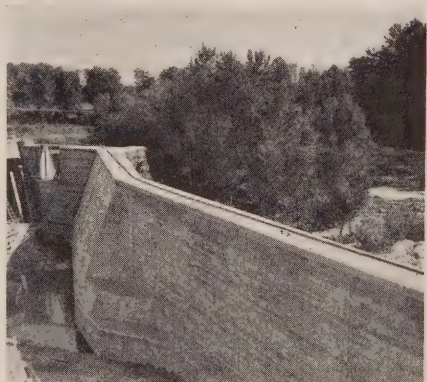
View of front of gravity wall after completion of 18 in. concrete blanket wall and cap.
